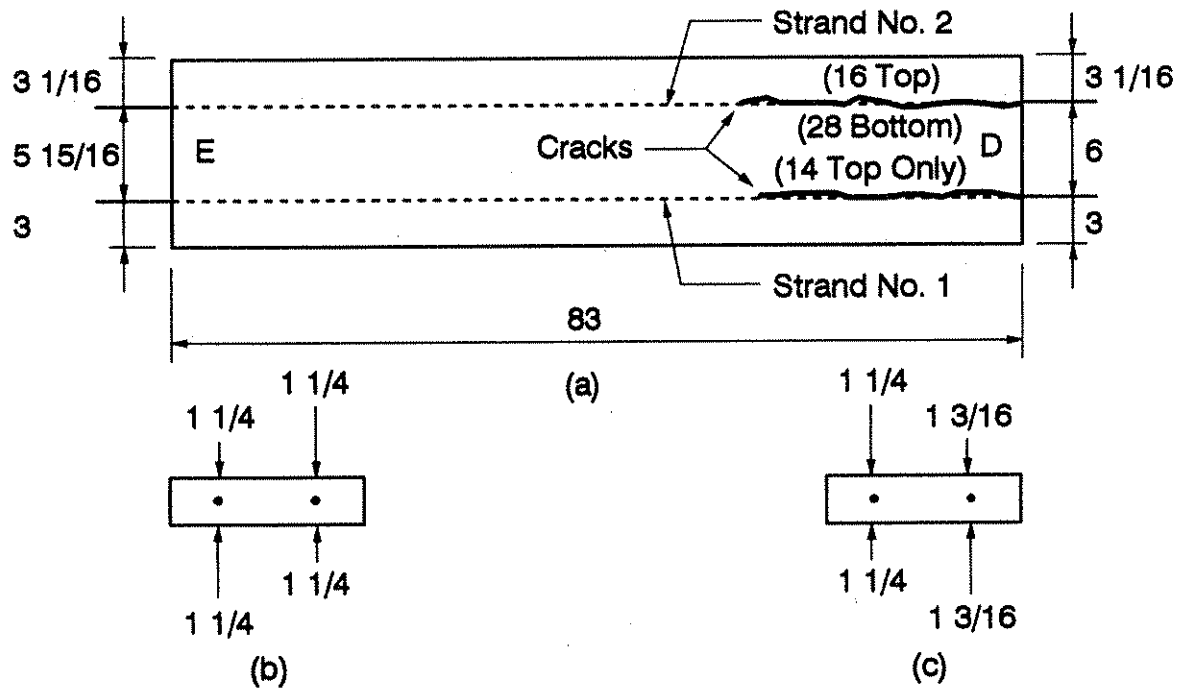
Specimen No. 3-2.5TC-10 (dimensions shown in inches):
